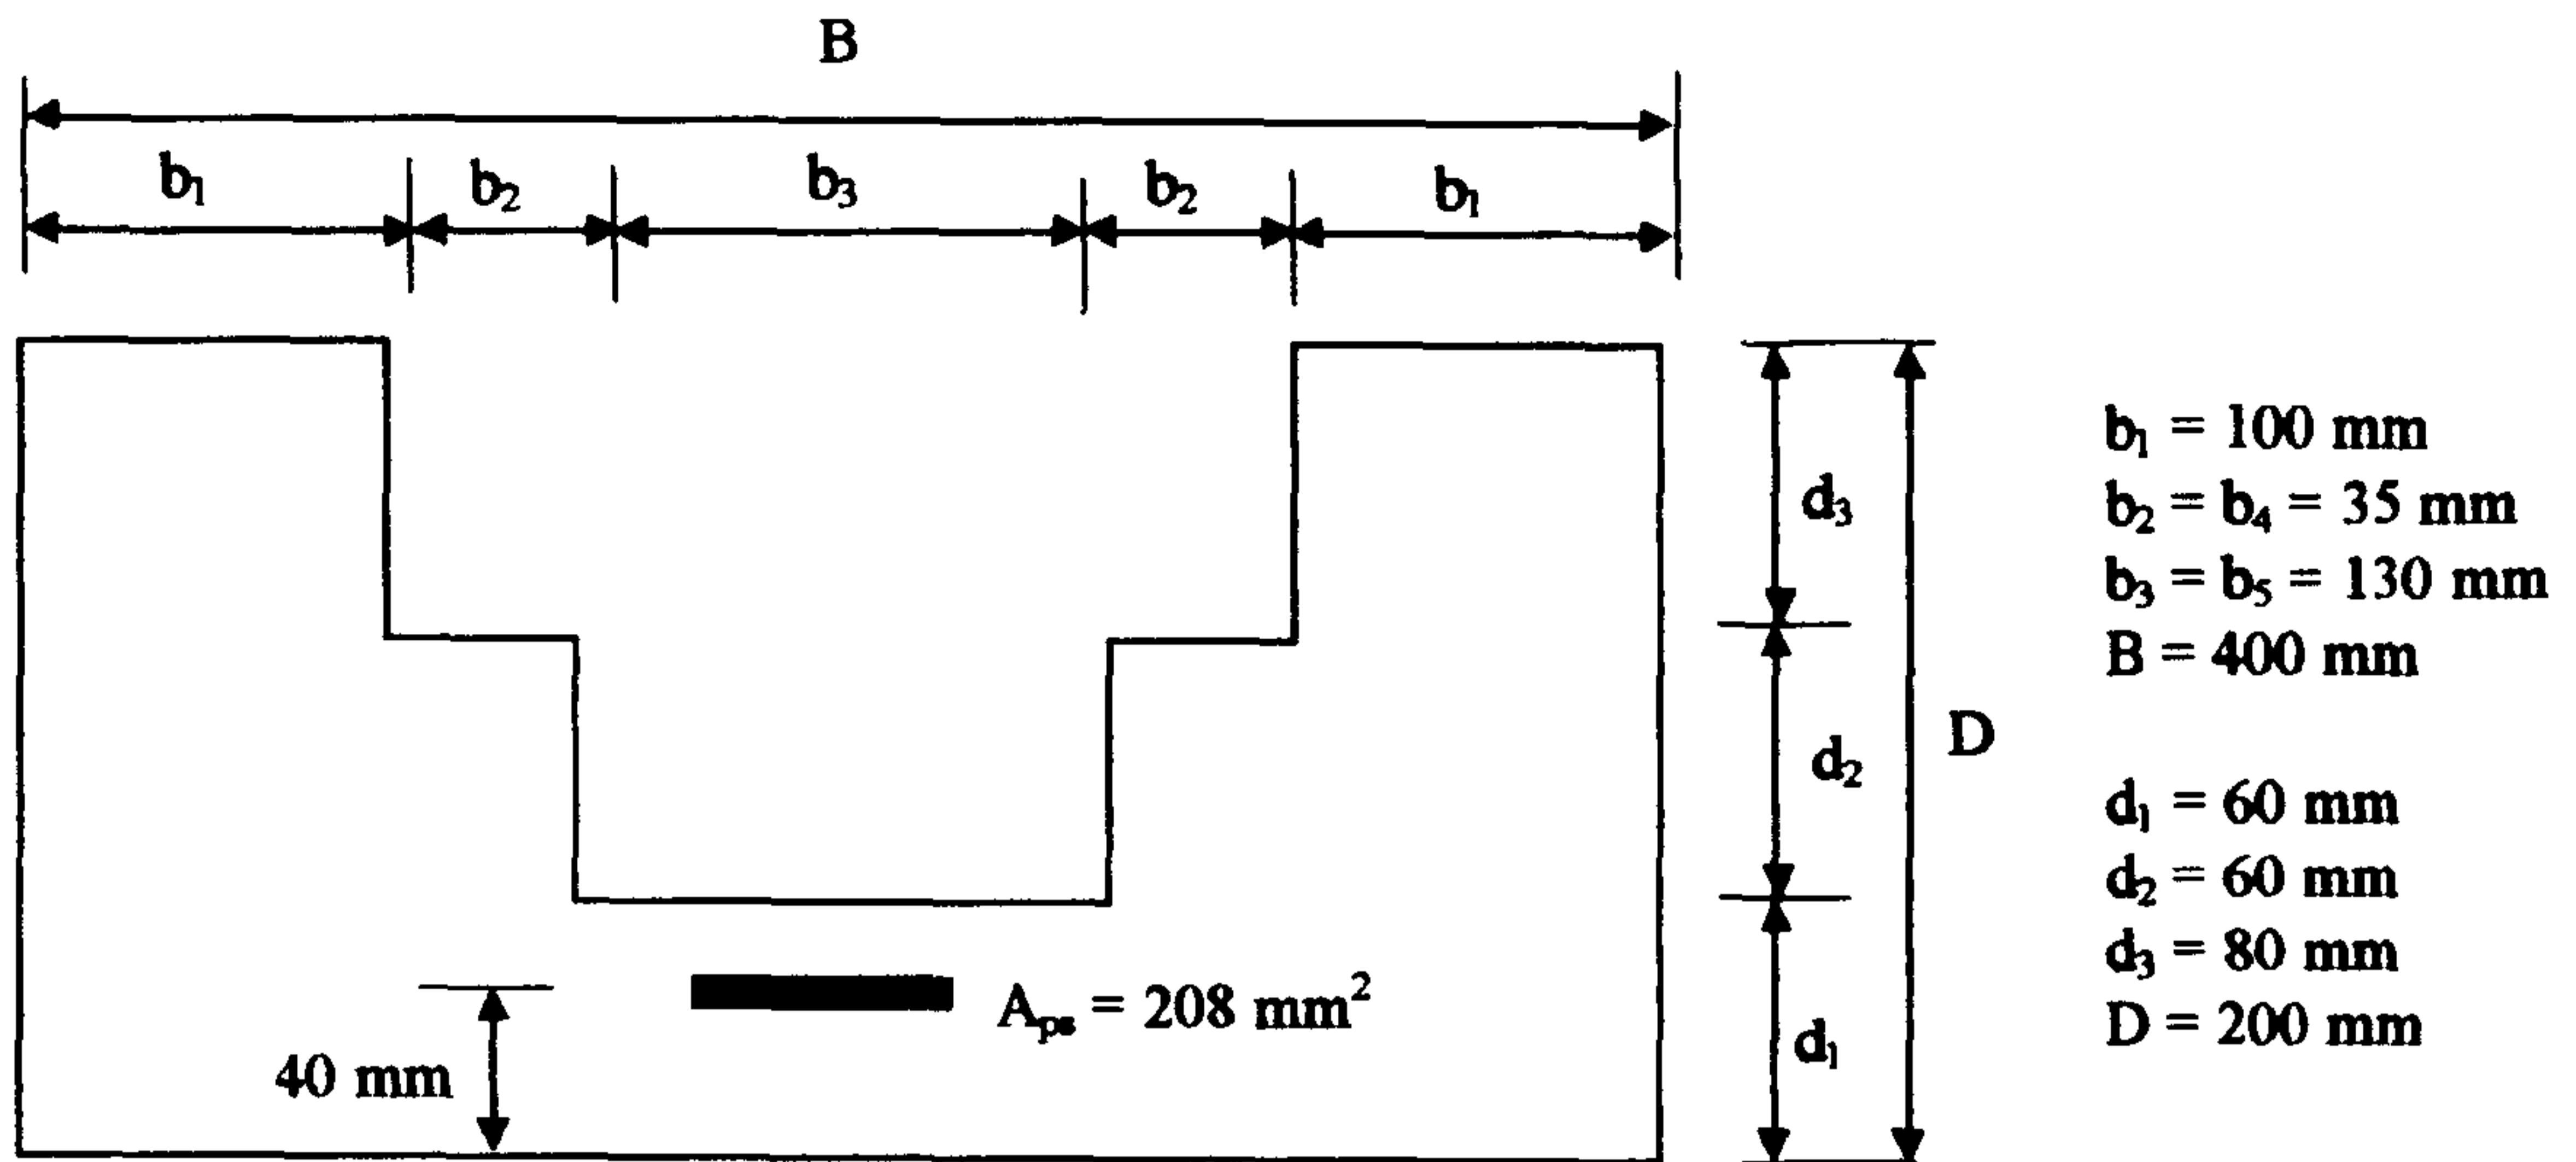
Concrete trough cross-sectional properties for example 1.
